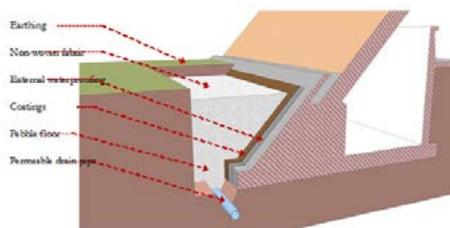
64 Diagram of renovation program for outside foundation waterproofing
